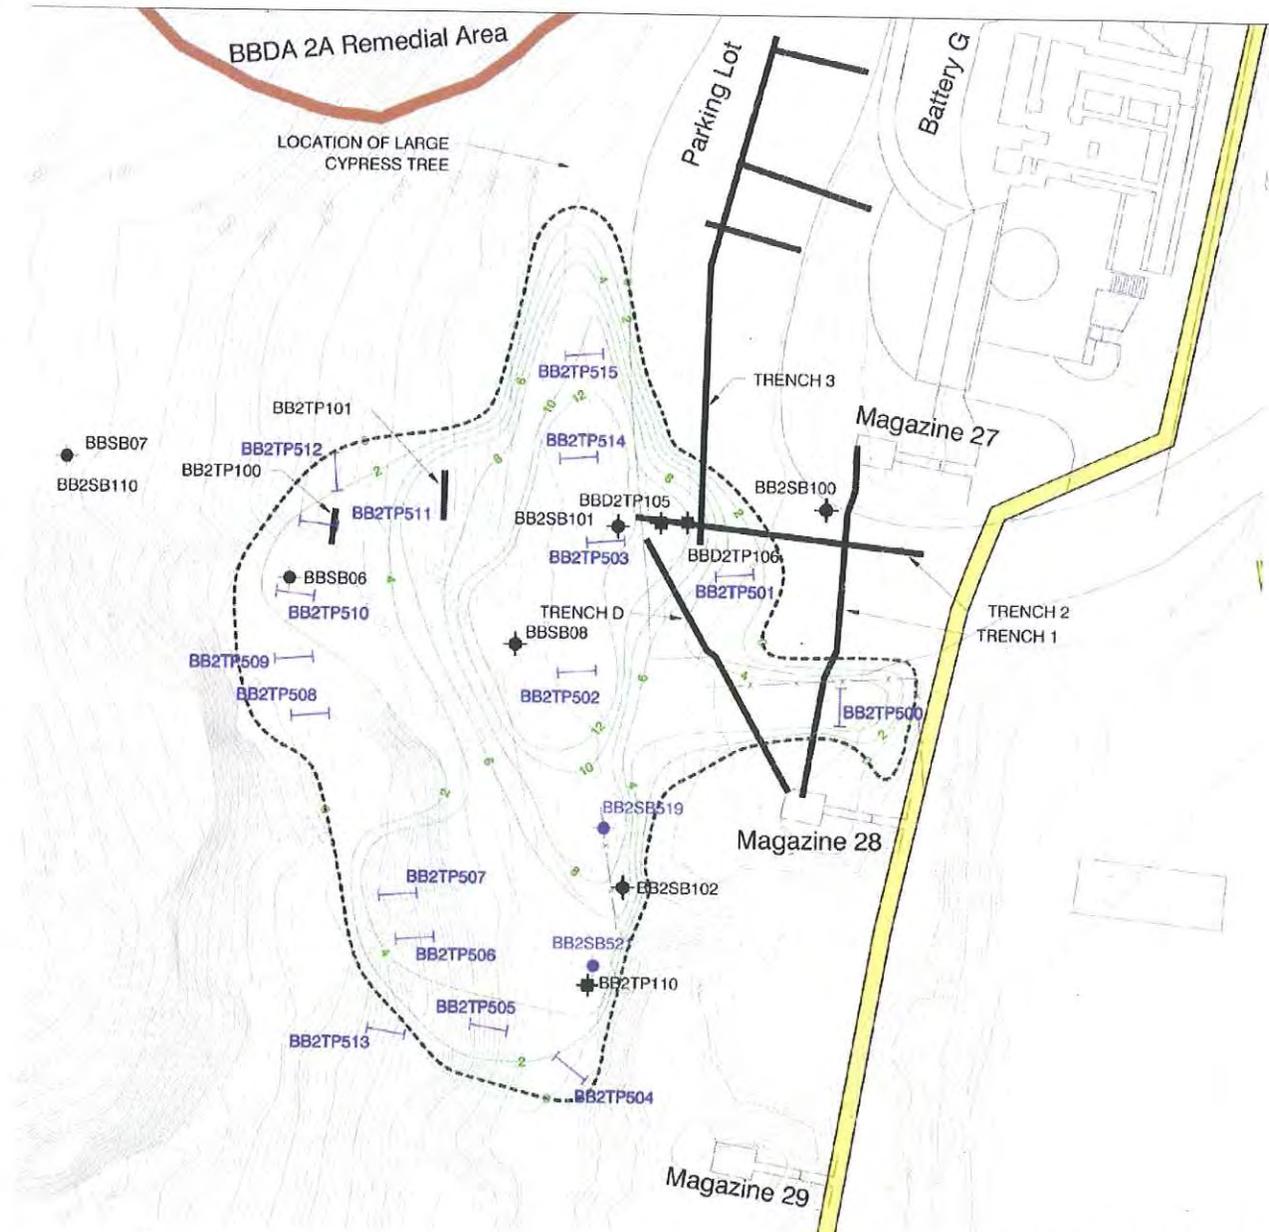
Preferred Remedial Alternative Site BBDA 2 (Excavation)
